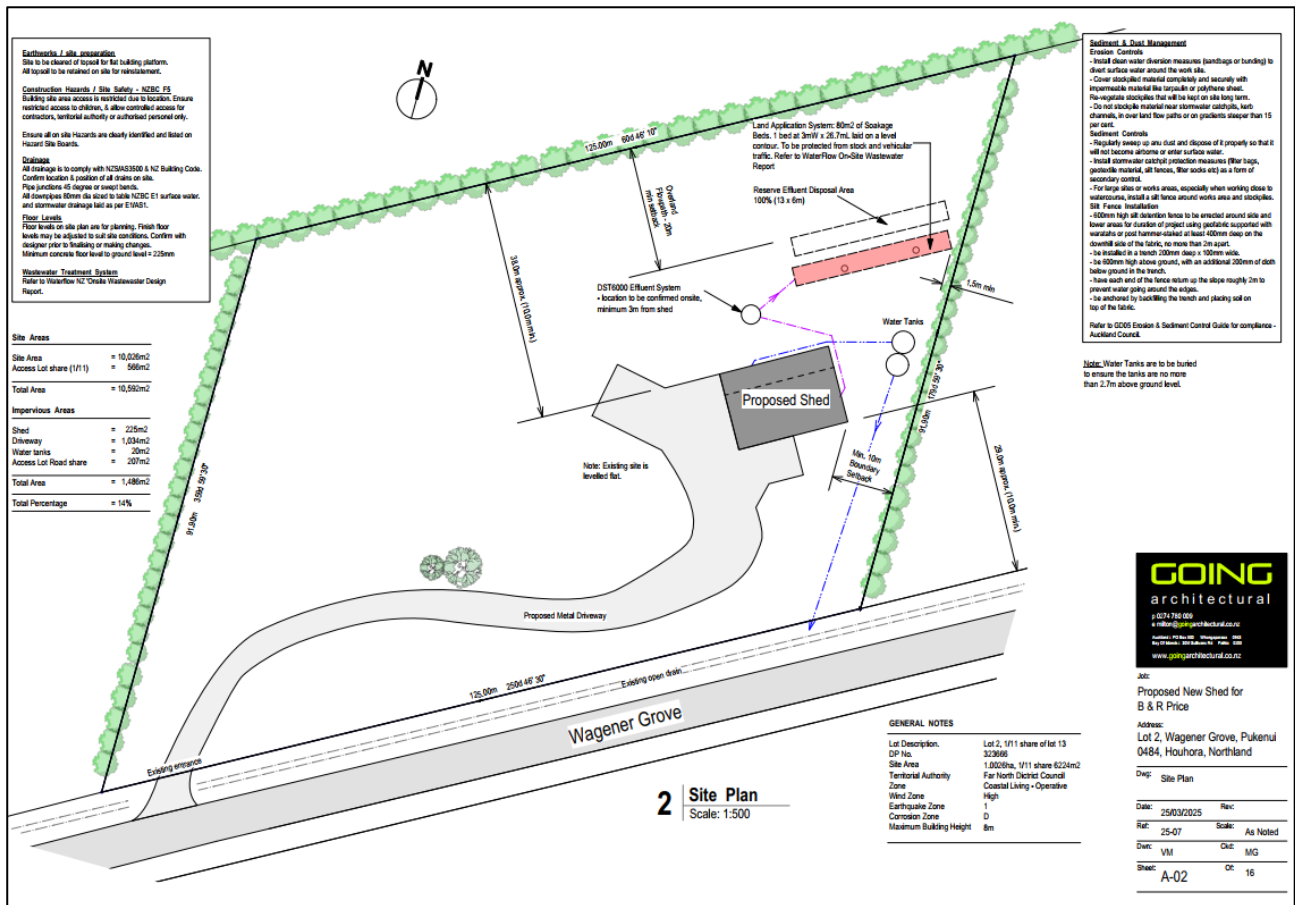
Snip of Proposed Site Plan Provided by Going Architectural (Ref No: 25-07, dated: 25.03.2025)
